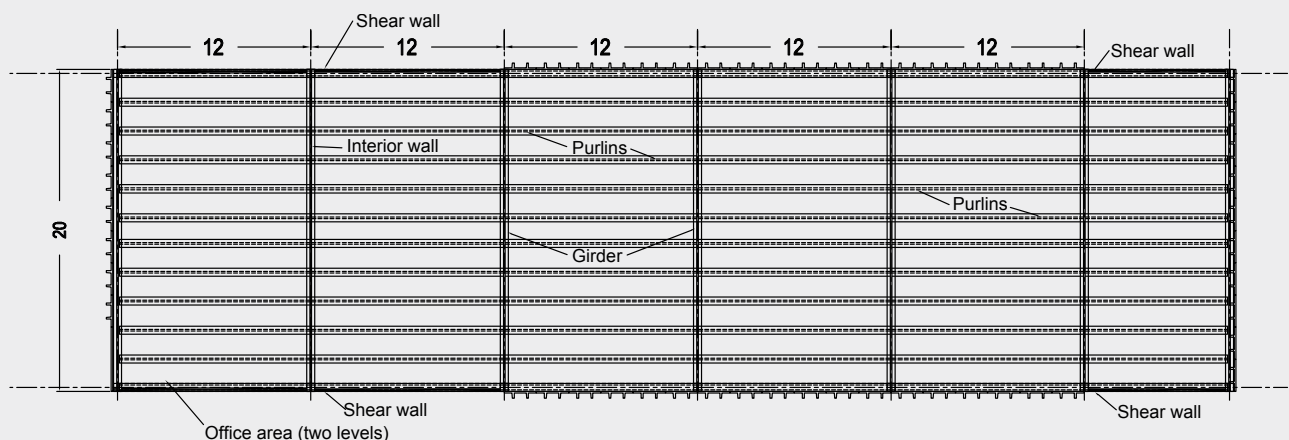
Roof framing plan used in an industrial building with offices. Note: All measurements are in meters. 1 m = 3.28 ft.
